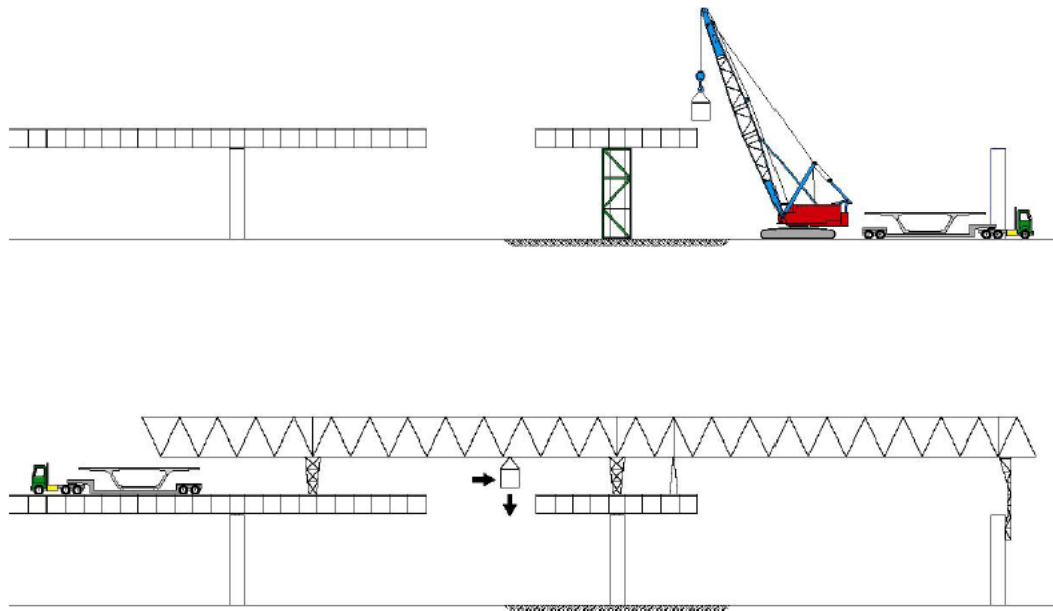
Two Balanced Cantilever Methods - Using Cranes with Stability Towers At Each Pier and Using An Overhead Launching Gantry
